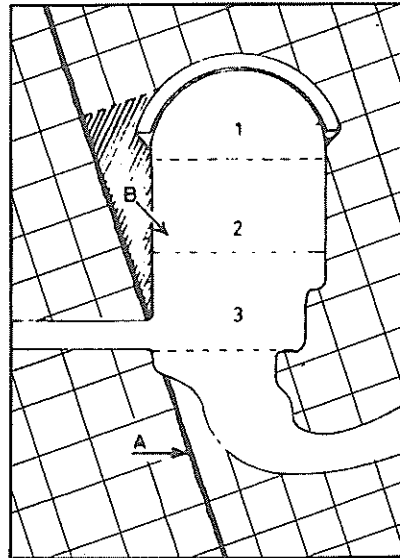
Section through a power plant showing a clay seam parallel with the axis of the hall (A). Part B slides out as soon as Section 3 is removed
